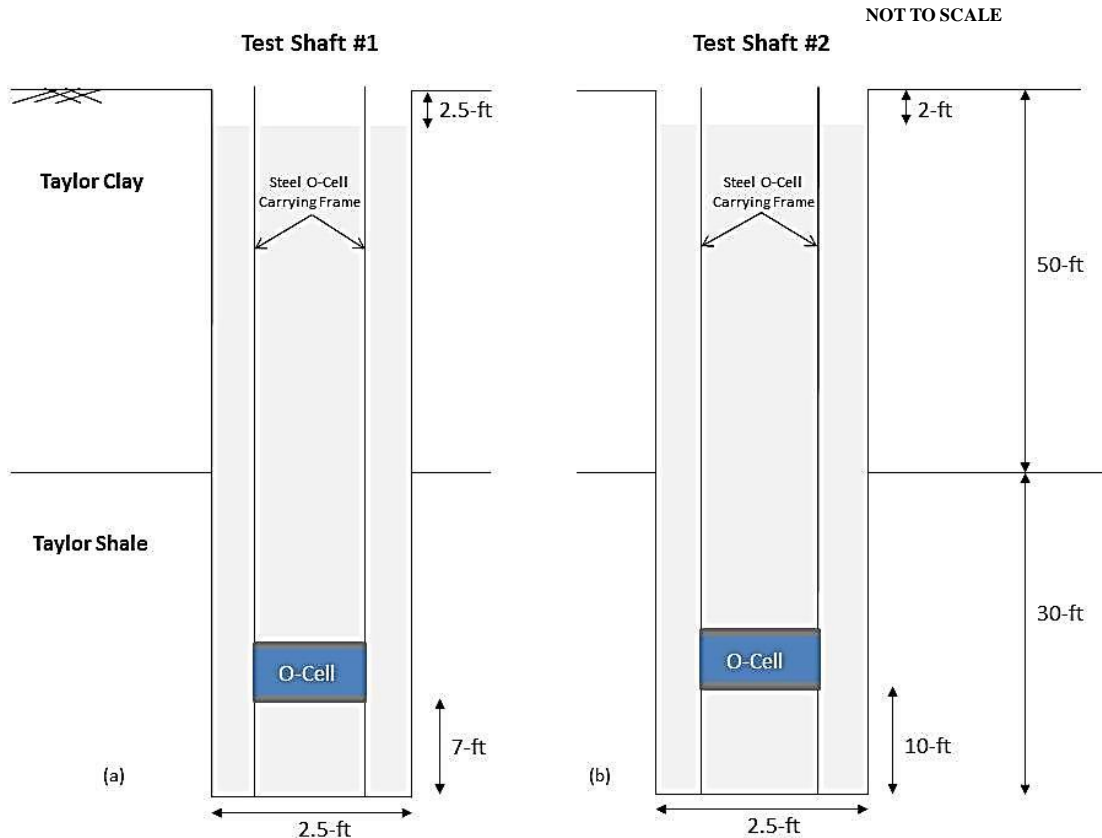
Location of O-Cell™ for (a) Test Shaft #1 and (b) Test Shaft #2
